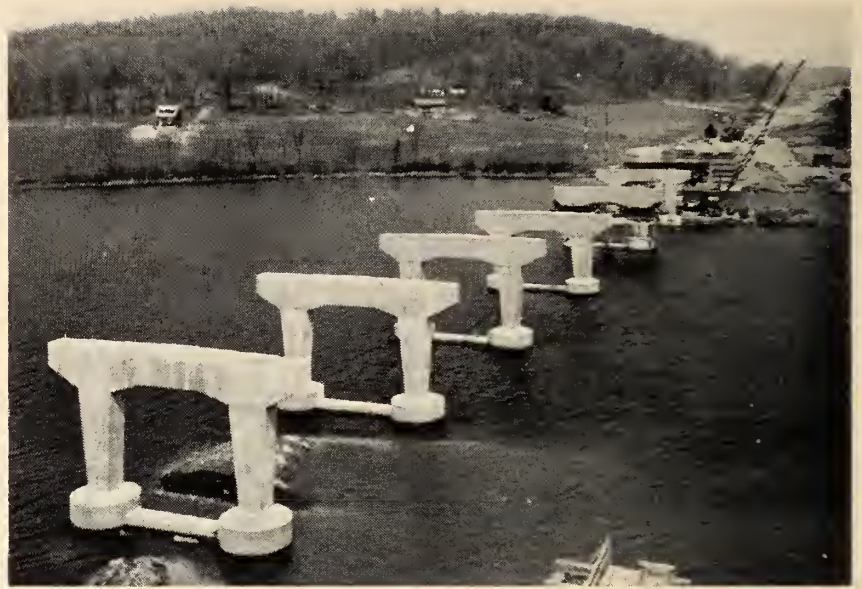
Overall view of Vernon Narrows Bridge just before completion of piers.
